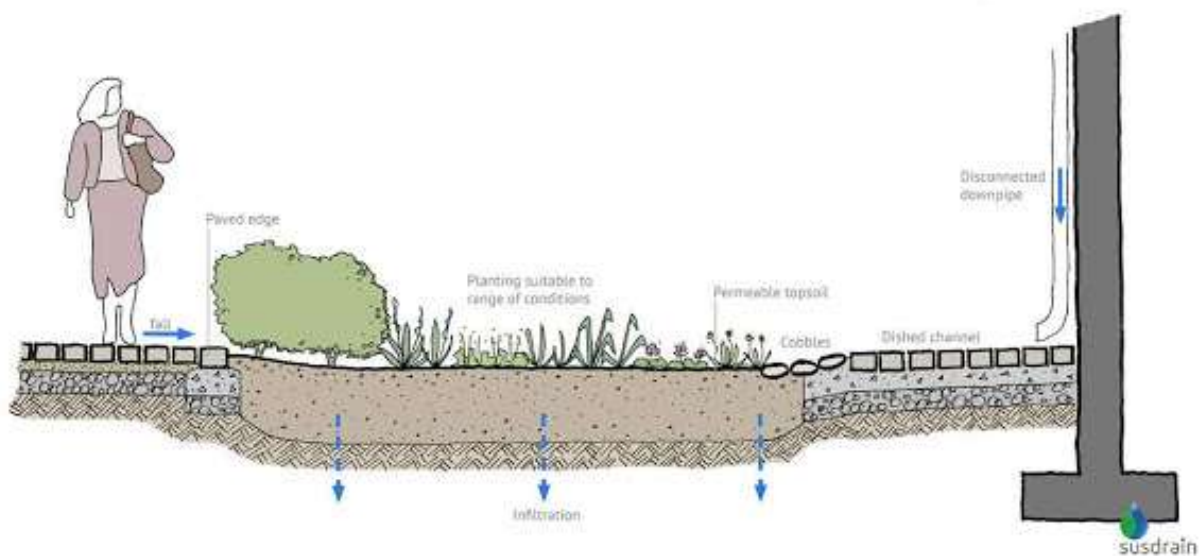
Drainage into linear raingardens (courtesy of SusDrain)
